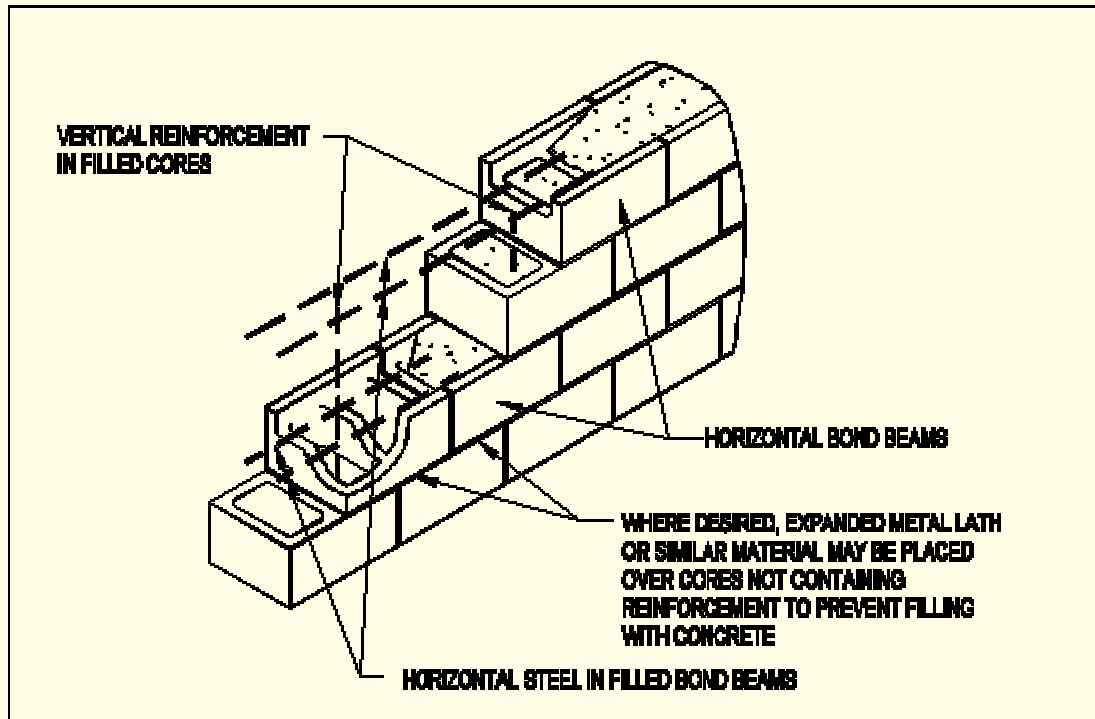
TYPICAL REINFORCEMENT DETAIL
